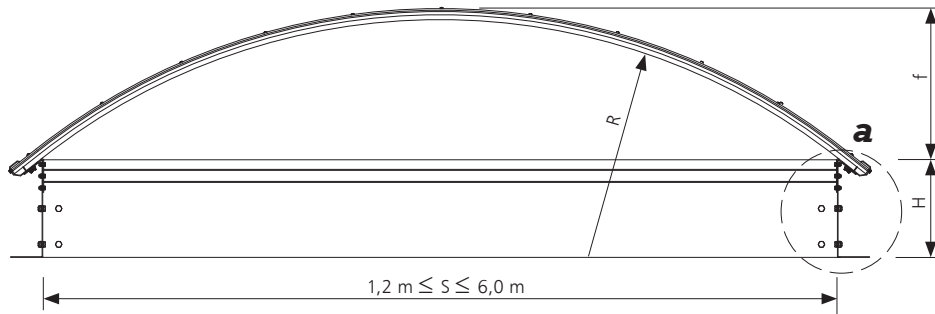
Cross section A-A of mcr PROLIGHT arch shaped continuous rooflight
